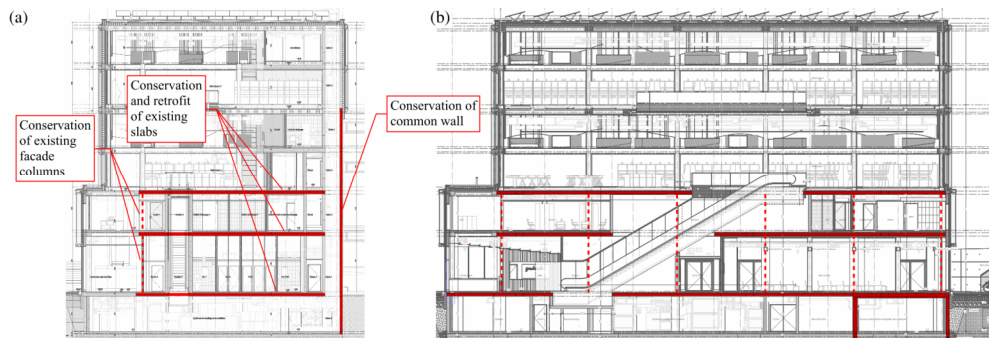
Project of the Grand Casino Prilly. In red the conserved structural elements: (a) transversal section; and (b) longitudinal section
